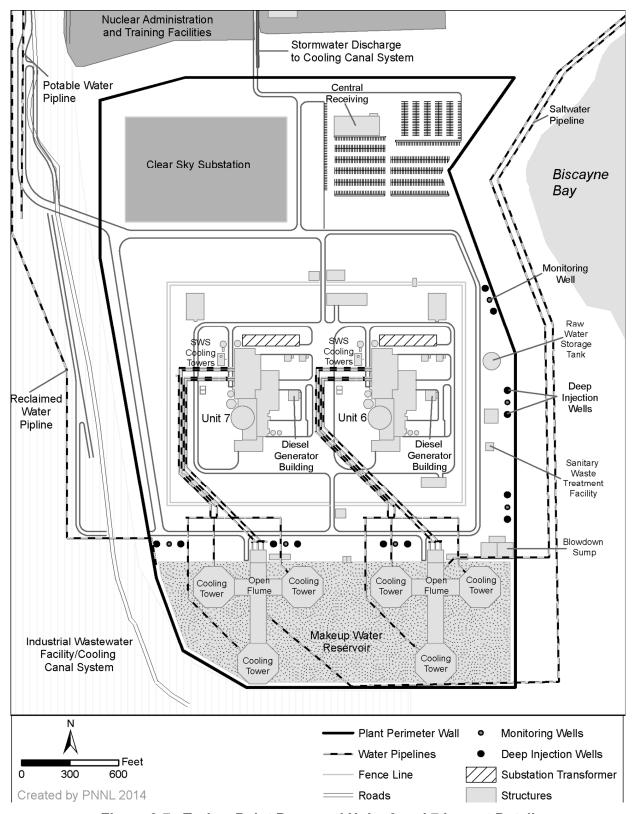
Turkey Point Proposed Units 6 and 7 Layout Detail
